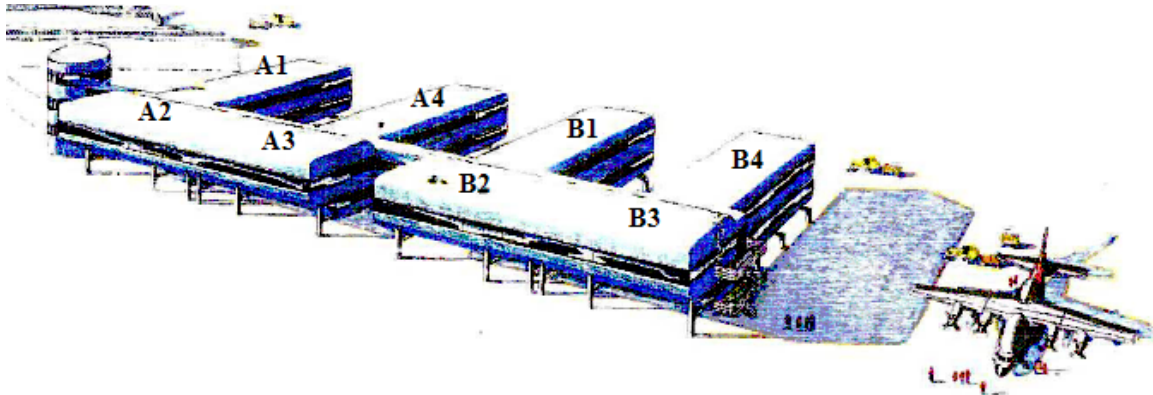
A drawing of the elevated building at South Pole Station with building numbers shown
